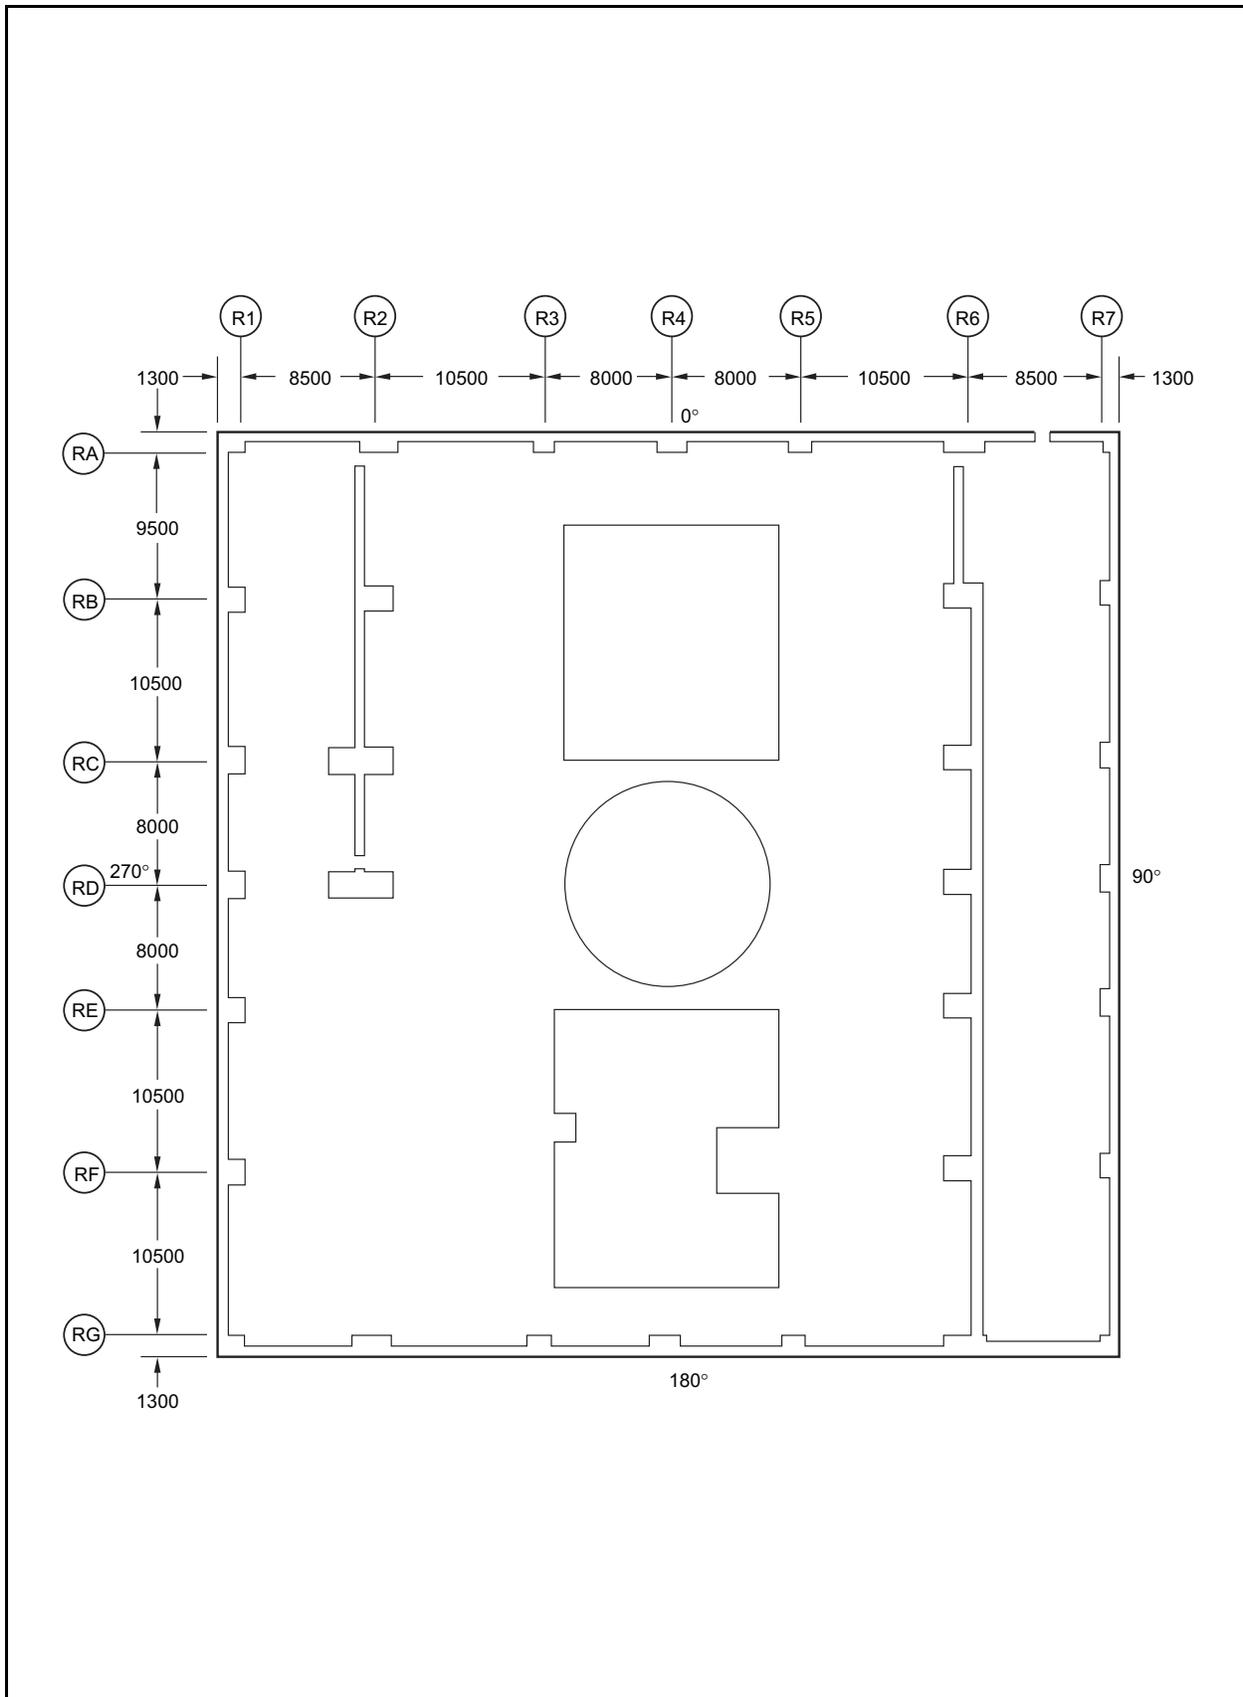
Reactor Building Arrangement Floor 4F Elevation 31700 mm
